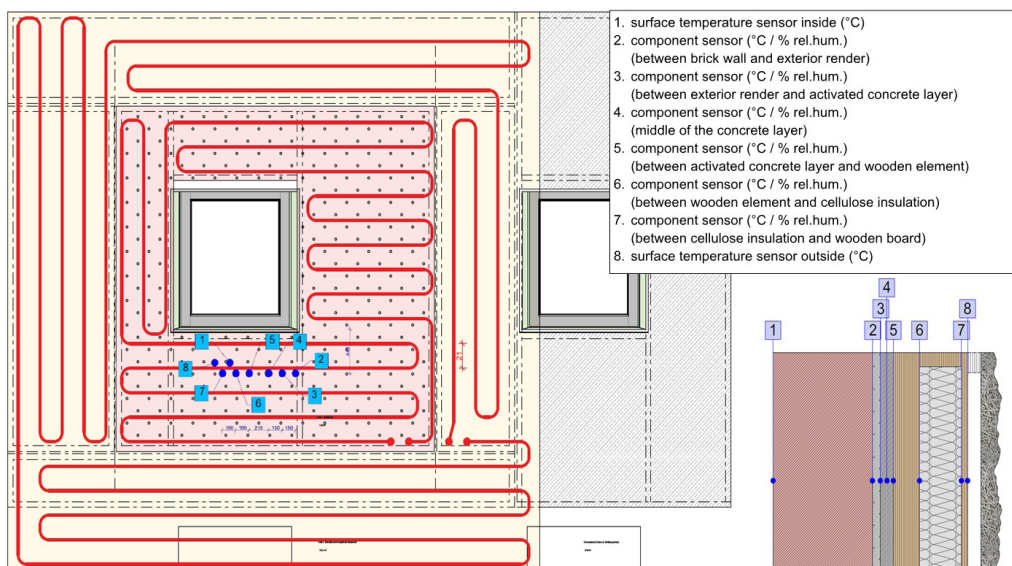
Facade prototype – heating circuit and wall construction (Source: own figure 2018)
